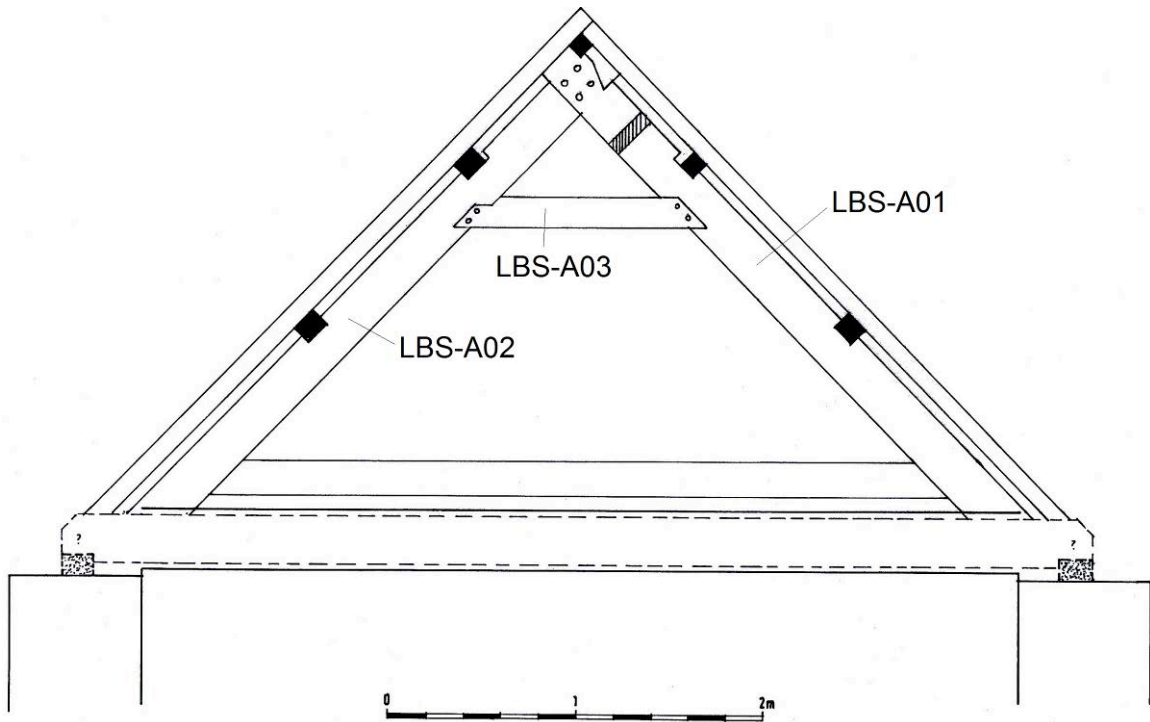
West range; truss 1 (east face), showing the location of samples LBS-A01–03 (Martin Roberts)
